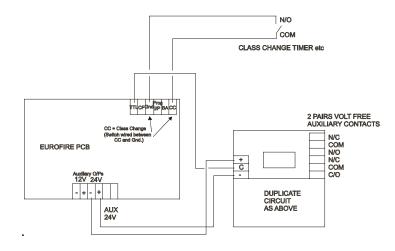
4WAY AUXILIARY RELAY PCB WITH TWIN CONTROL CIRCUITS
